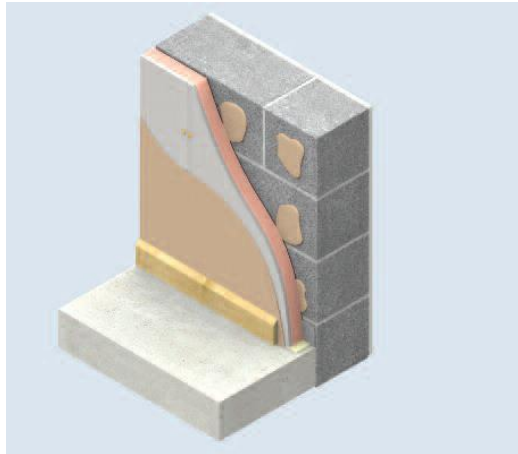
Example of insulated plasterboards for masonry solid wall.
